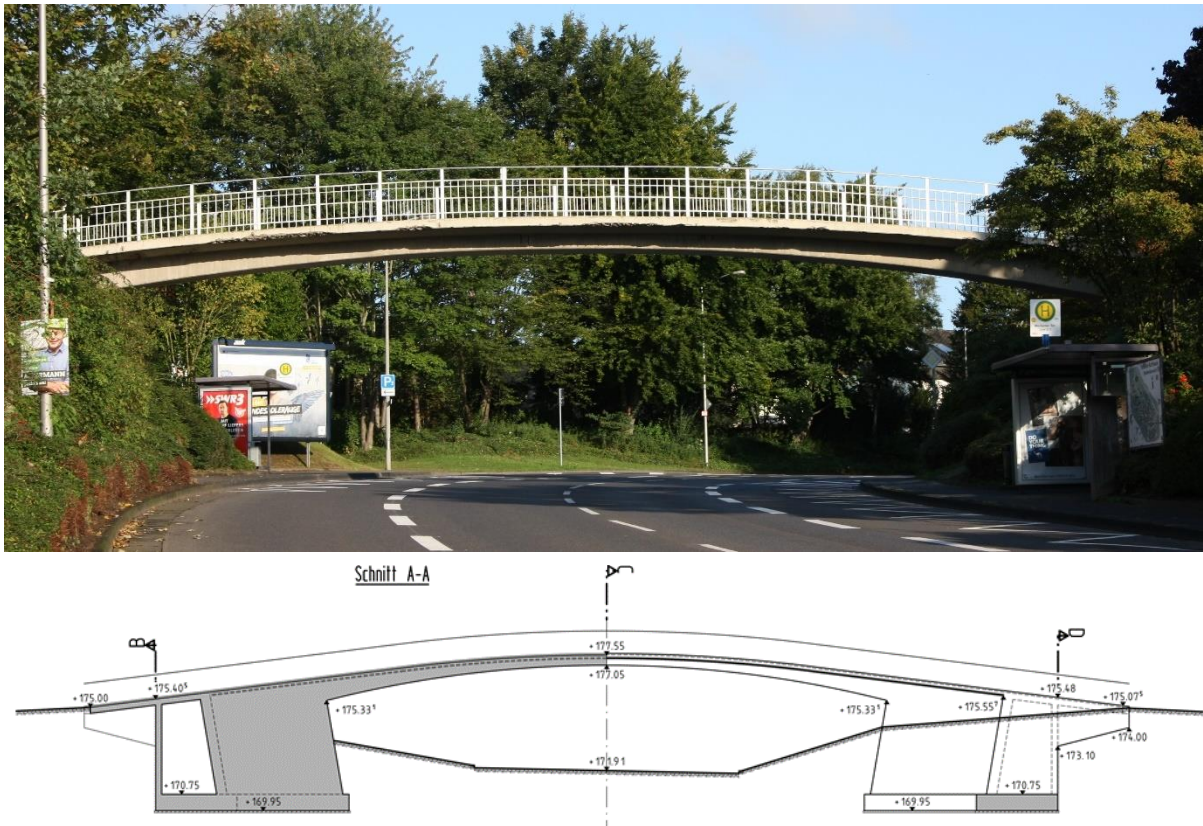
Existing concrete bridge across the Berliner Ring in Koblenz
